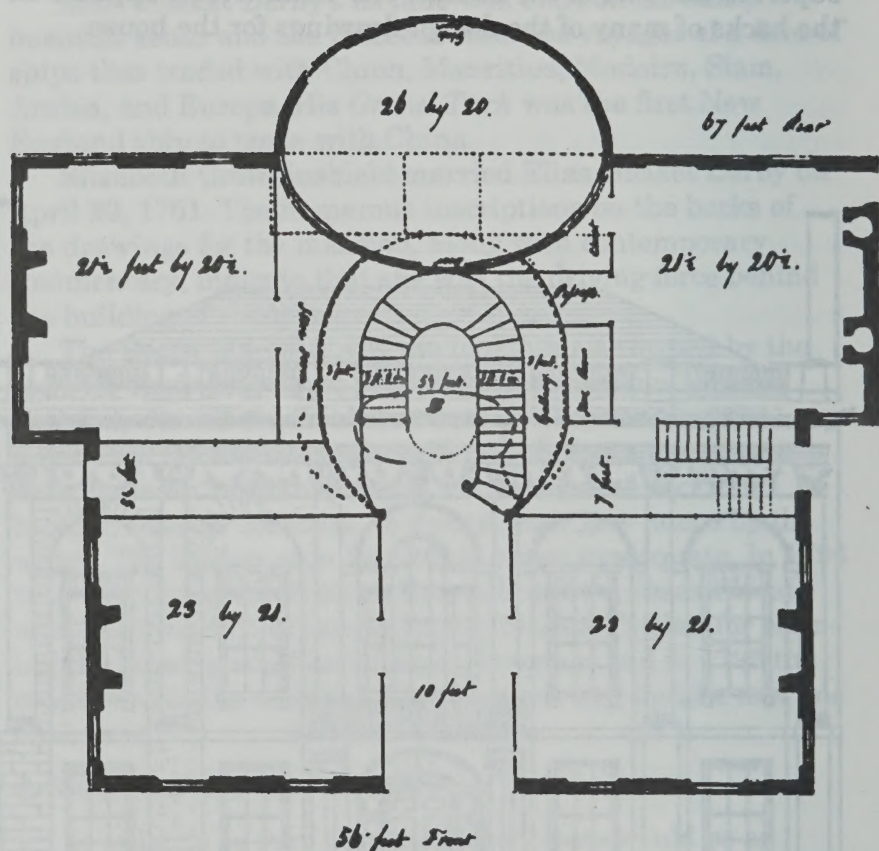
First-Floor Plan, Derby Mansion, Drawn by an unknown draughtsman, ca. 1796. This was evidently the final floor plan for the house, as it is inscribed on the back, in Mrs. Derby's handwriting, "our House Plan."
